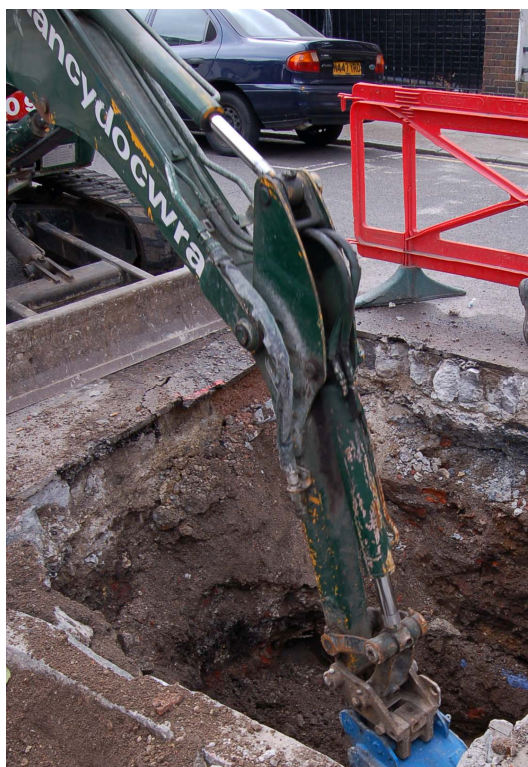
Monitoring ground works in Lowood Street, with backfill deposits visible in the exposed section
